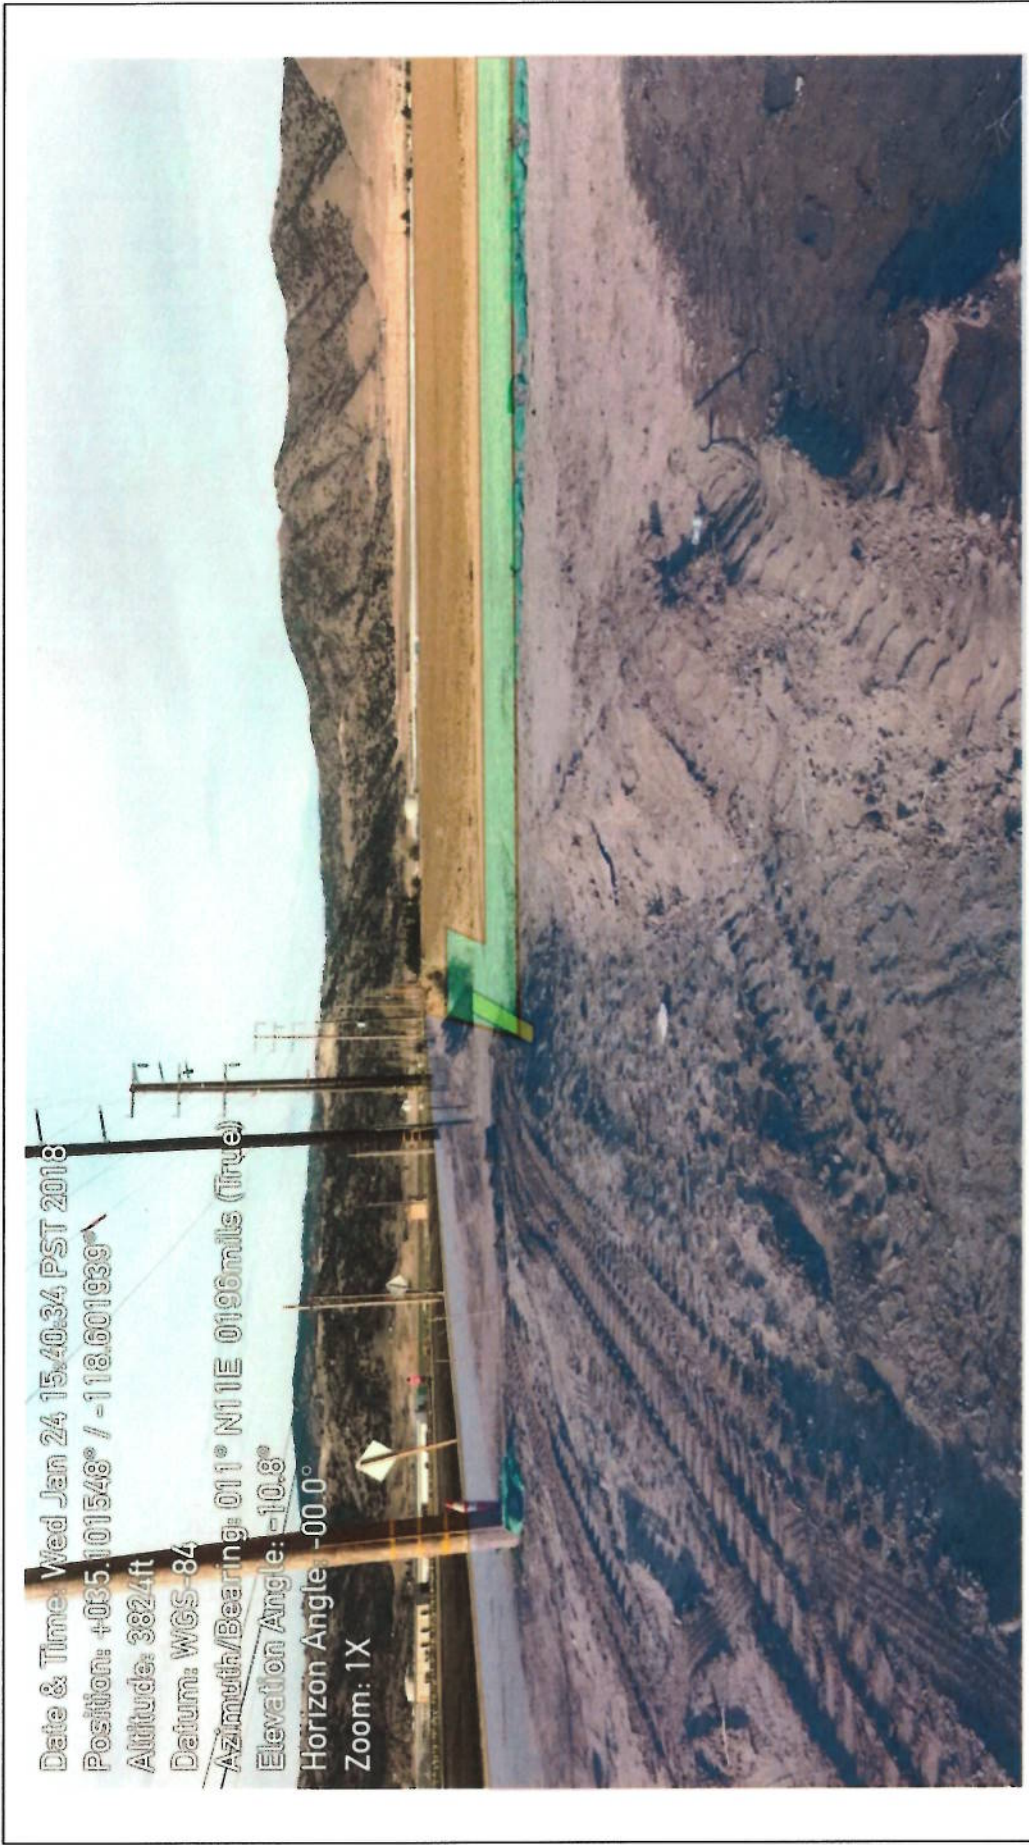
View north of the NTP 1 approved LOD, the farm road culvert location, and associated expanded LOD.
